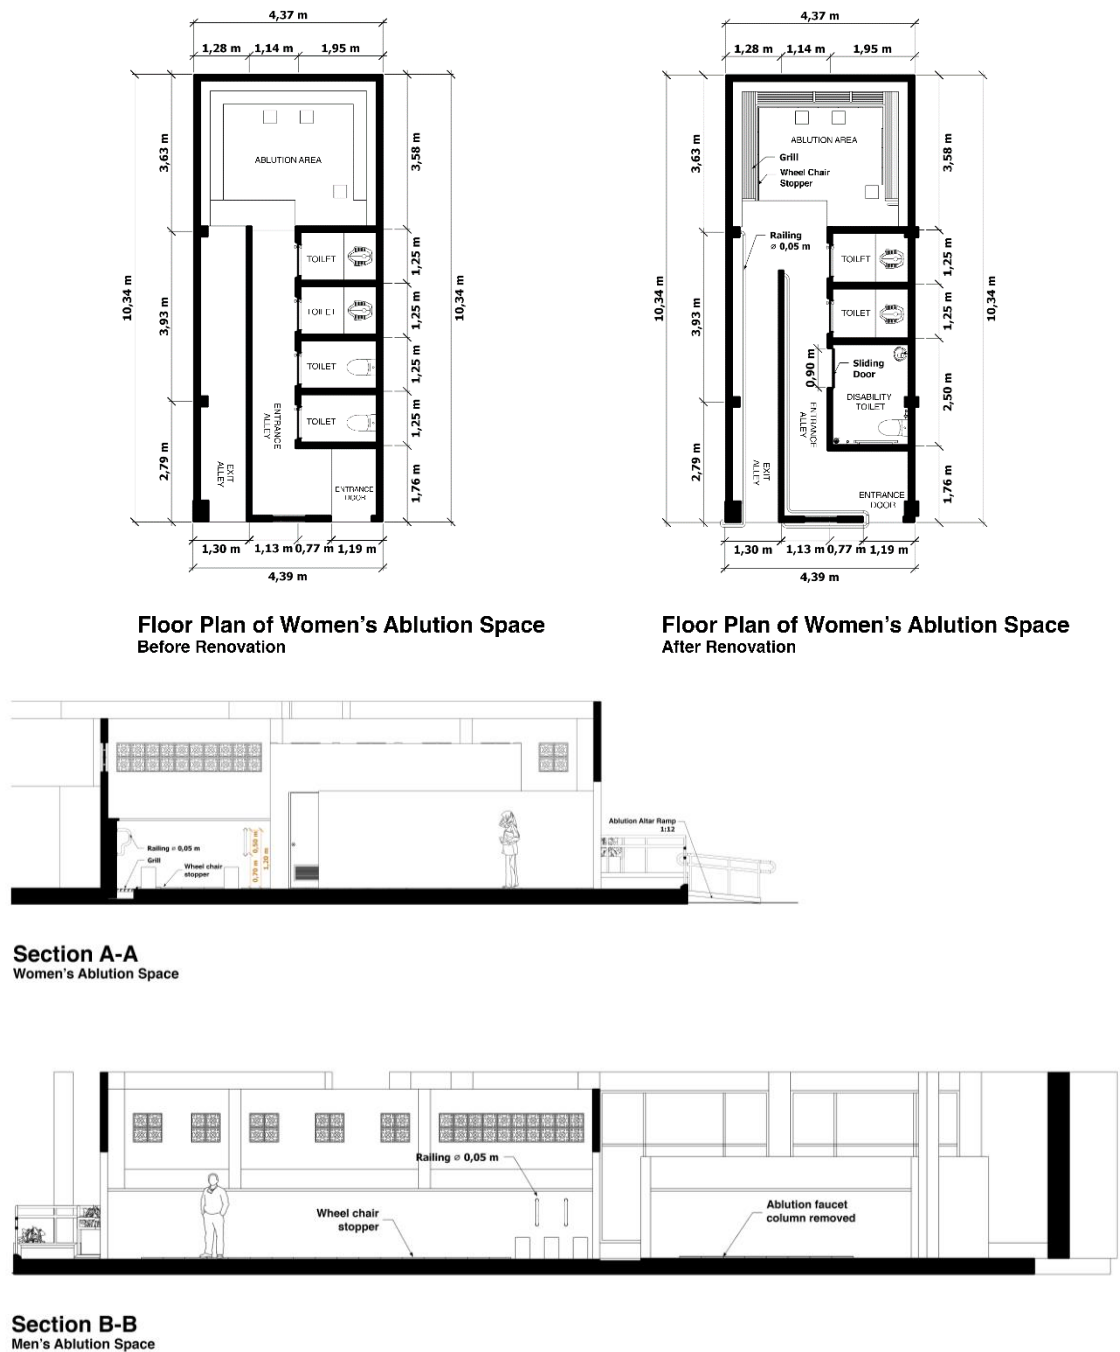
Floor Plan and Section of Ablution and Bathroom Area (Before and After Renovation)
